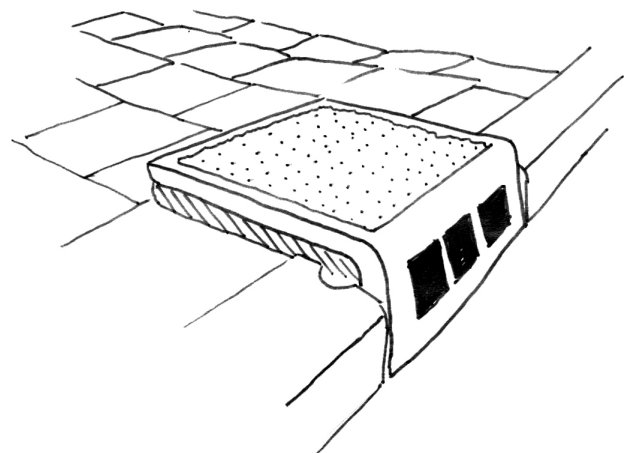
Obstacle: Shaking because of sunken pavement or wells
